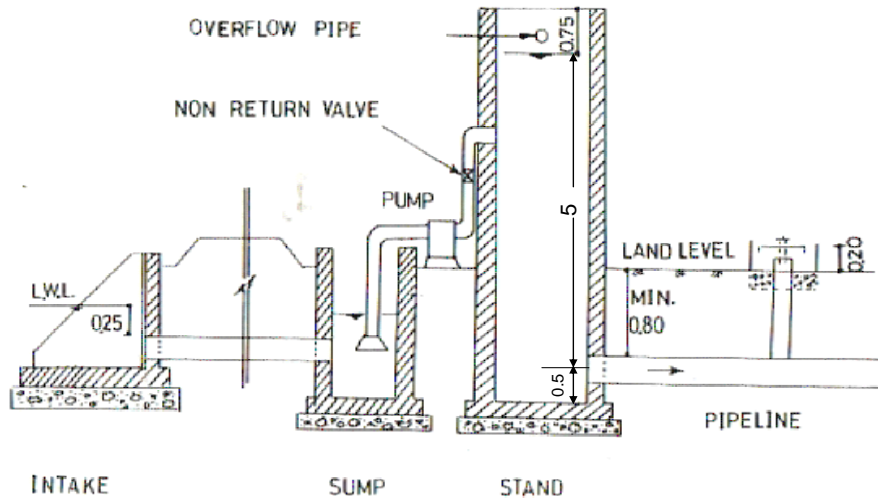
Sectional elevation of pipe line Meskas layout -Dimension in m- IIP (2003).
